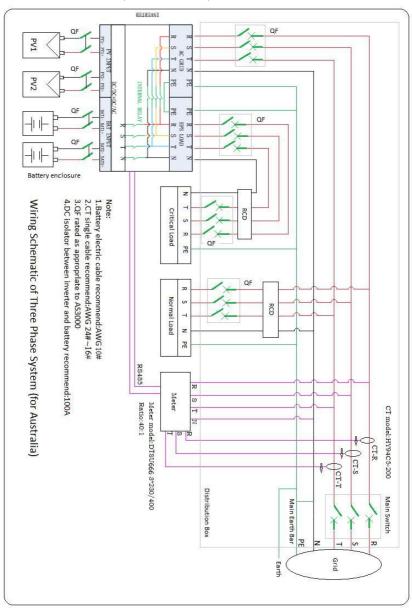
Electrical connections (Plan B:Meter +CT)
